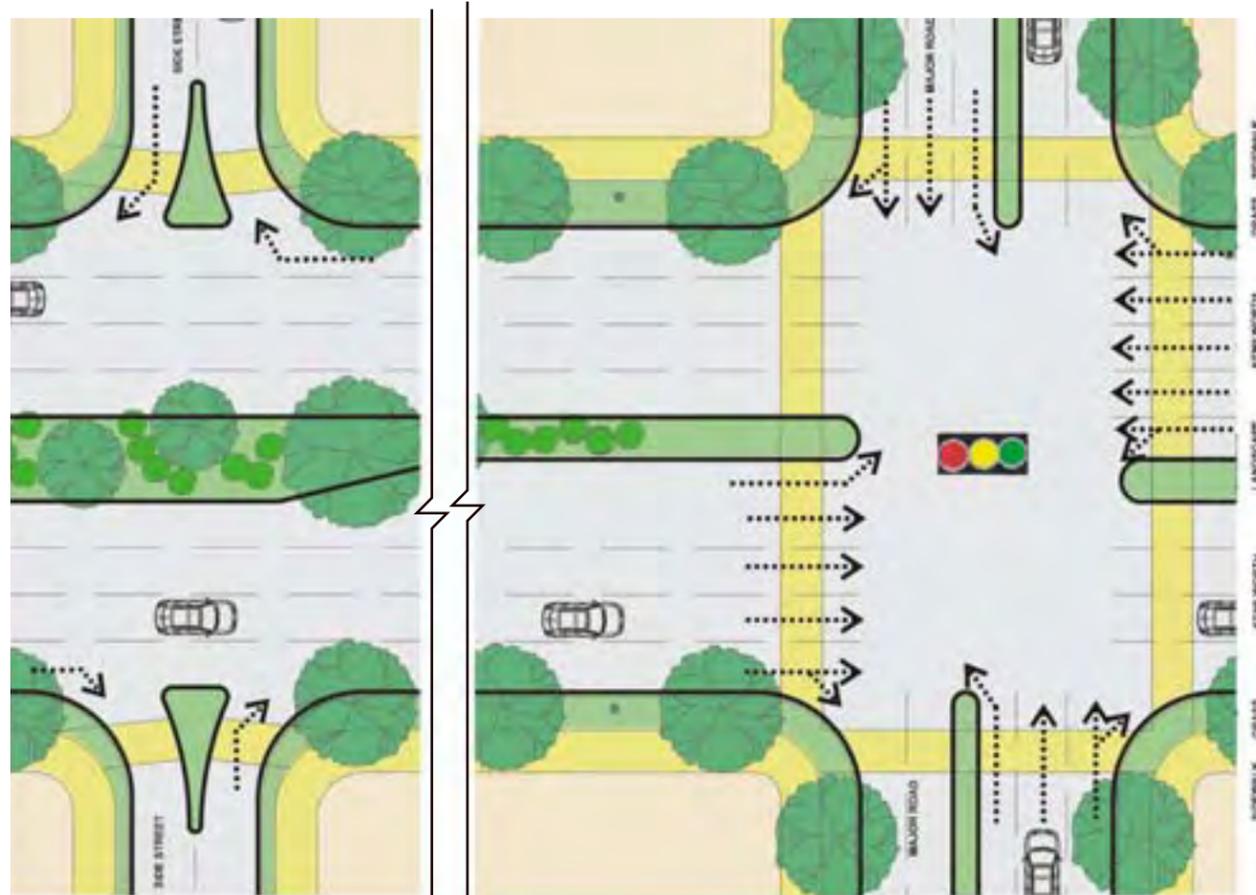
Typical Plan for a boulevard (tree-lined shoulders and median)
